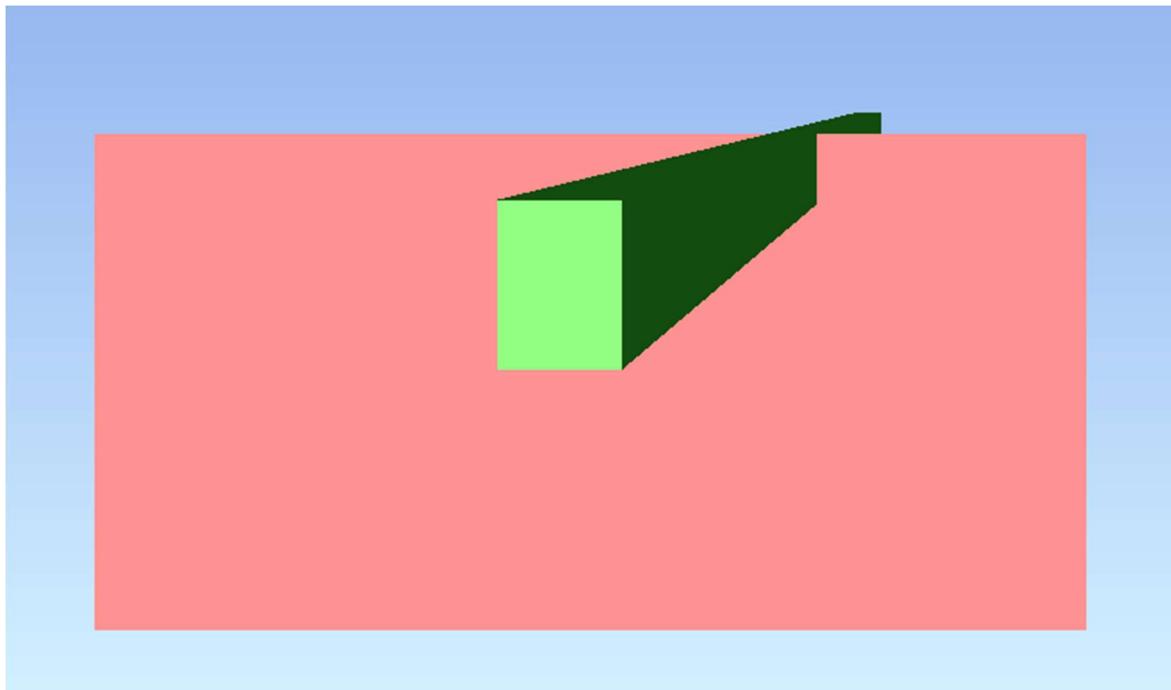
Medium Clash of Architectural wall (Element ID 1316) vs Structural secondary beam (Element ID 181270) – Left Side View
